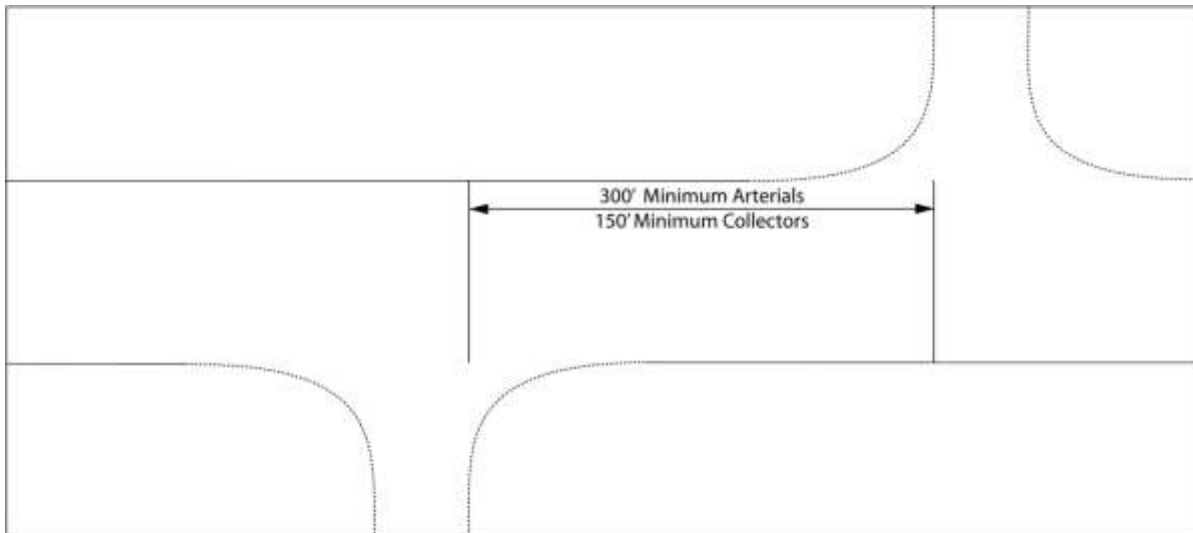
Undivided Roadway, (Major Traffic Generators)
